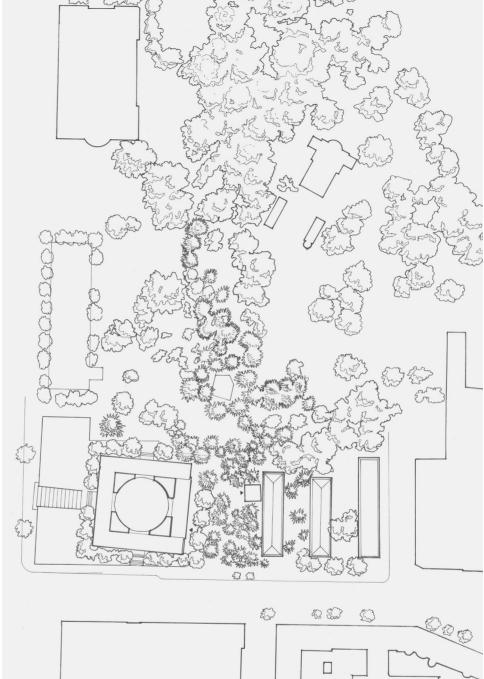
Proposed Site Plan, 1:2000 @ A3.
